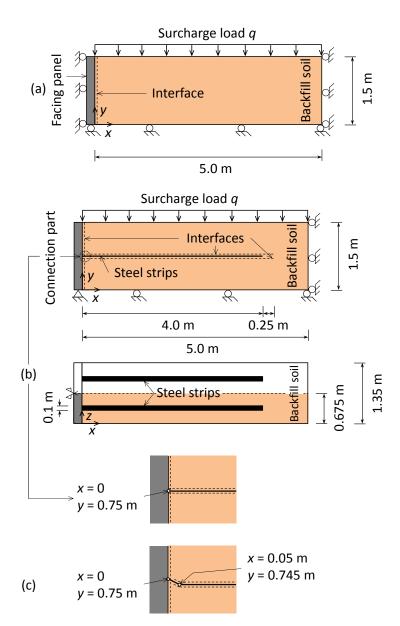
Schematic showing single precast concrete panel wall segment: (a) without steel strips, (b) with steel strips defined horizontally, and (c) with steel strips defined specially at the connection part (Note: the extension of interfaces between the steel strips and backfill is applied only when using PLAXIS; x is the horizontal direction; y is the vertical direction; z is the out-of-plane direction)
